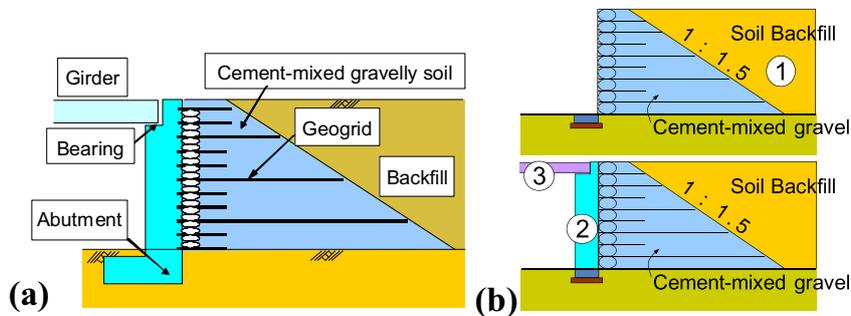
GRS bridge abutment; (a) structure; and (b) construction procedure.
